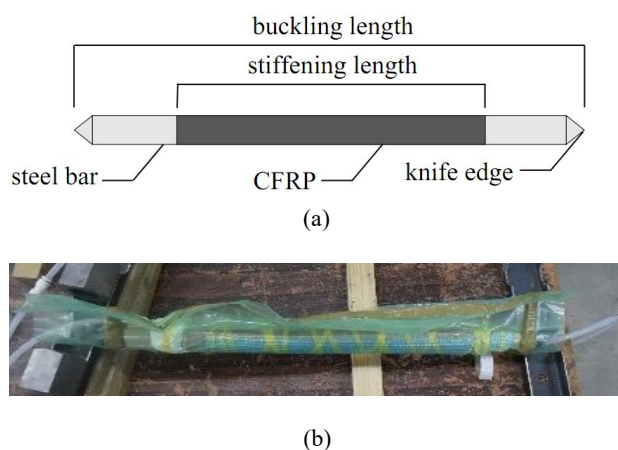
Tested specimen: (a) specimen configuration, (b) molding process
